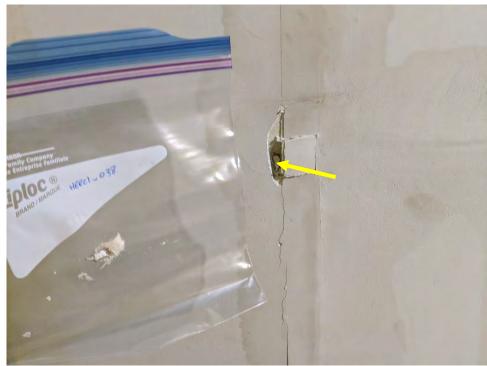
This photo shows sample location HERC 1-038 which is of ACM tan joint compound attached to plywood in one wall found in the fan room.
